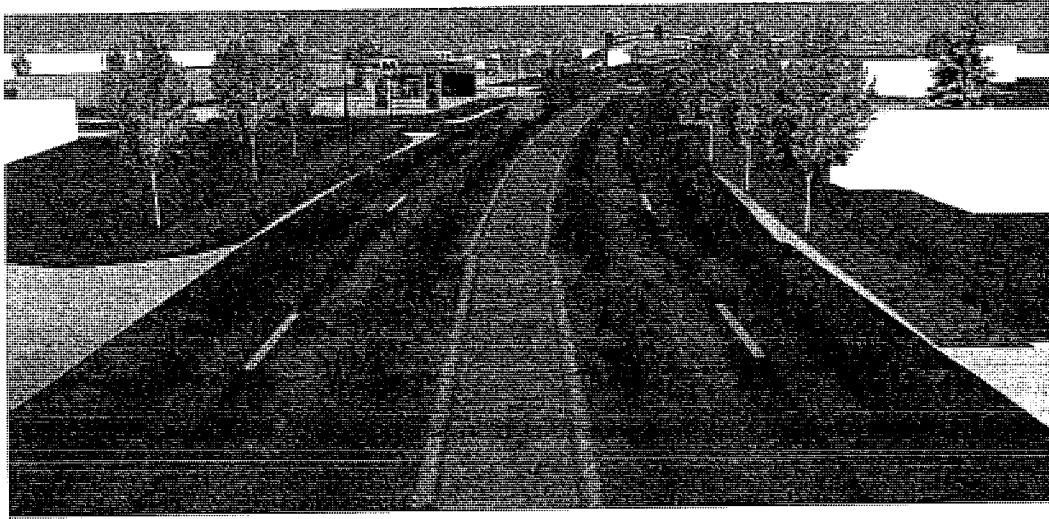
This view is Option 3 looking south near the 14th Avenue and Washington Street intersection on Lincoln Road.
